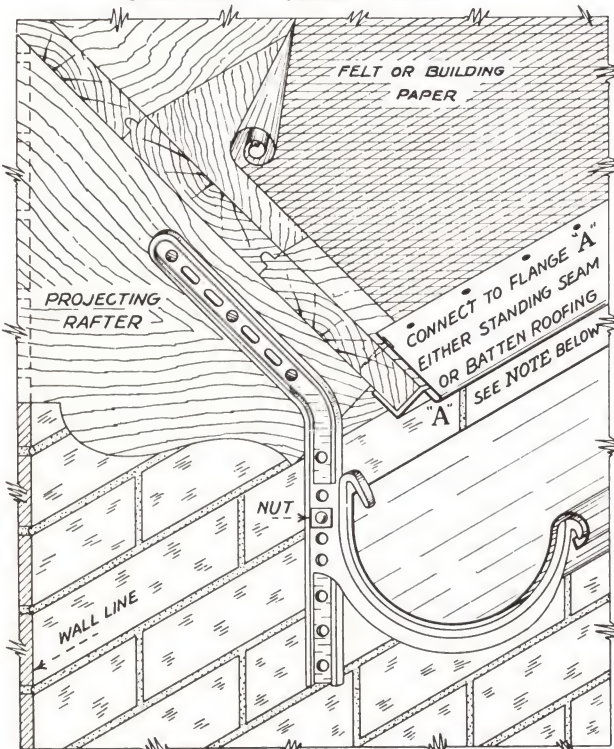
SINGLE BEAD EAVE TROUGH IN CAST HANGER HAVING ADJUSTABLE SHANK TO SCREW AGAINST EXPOSED RAFTER - SCALE - 2"-1'-0"
